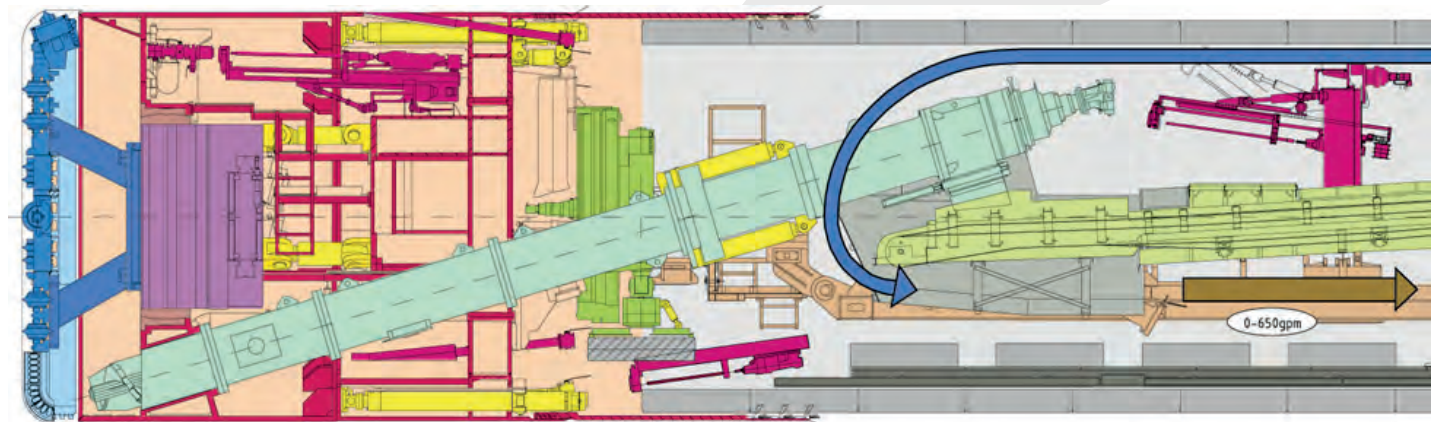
Arrowhead Tunnels Project – Interior Schematic of the TBM Hydraulic Conveyance System
